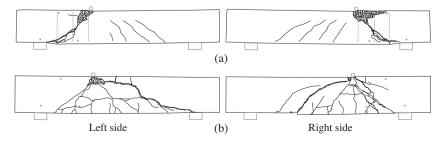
Crack pattern obtained for Beam 5. (a) First test; (b) Second test, beam repaired with plain concrete.
